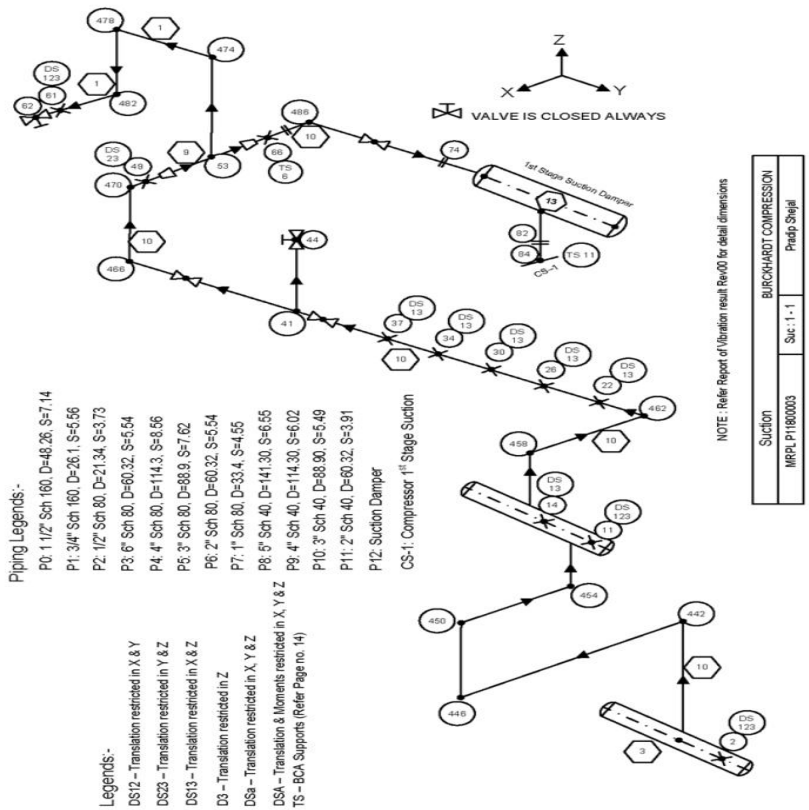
Sketches of Suction Piping for Vibration Study
